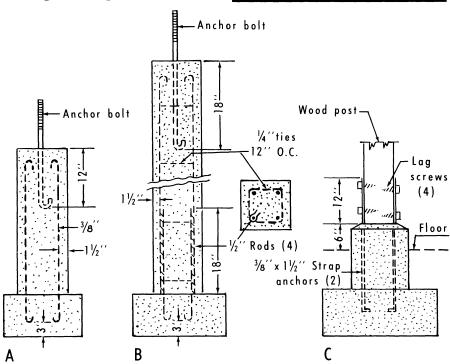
A, Method of reinforcing and anchoring short piers; B, method of reinforcing larger piers (note how the dowels are wrapped to the reinforcement with baling wire); C, method of anchoring wood posts.
